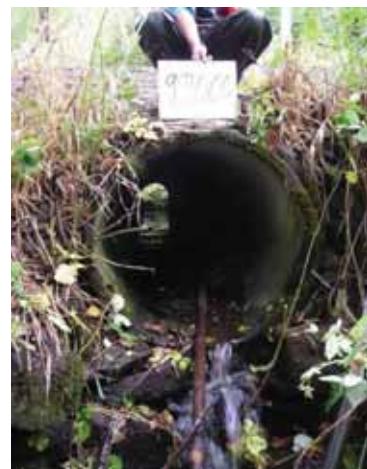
A concrete round culvert, 0.91 m (3 ft) in diameter was considered a fish passage barrier due to a 0.6 m (1.97 ft) outfall drop and a 1% slope.
